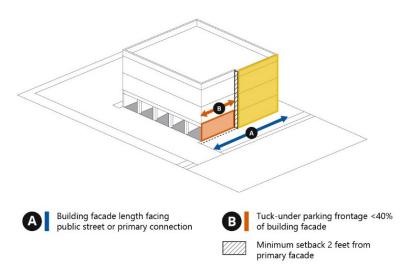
Tuck-under Parking Width Less Than 40% of Building Facade Length
